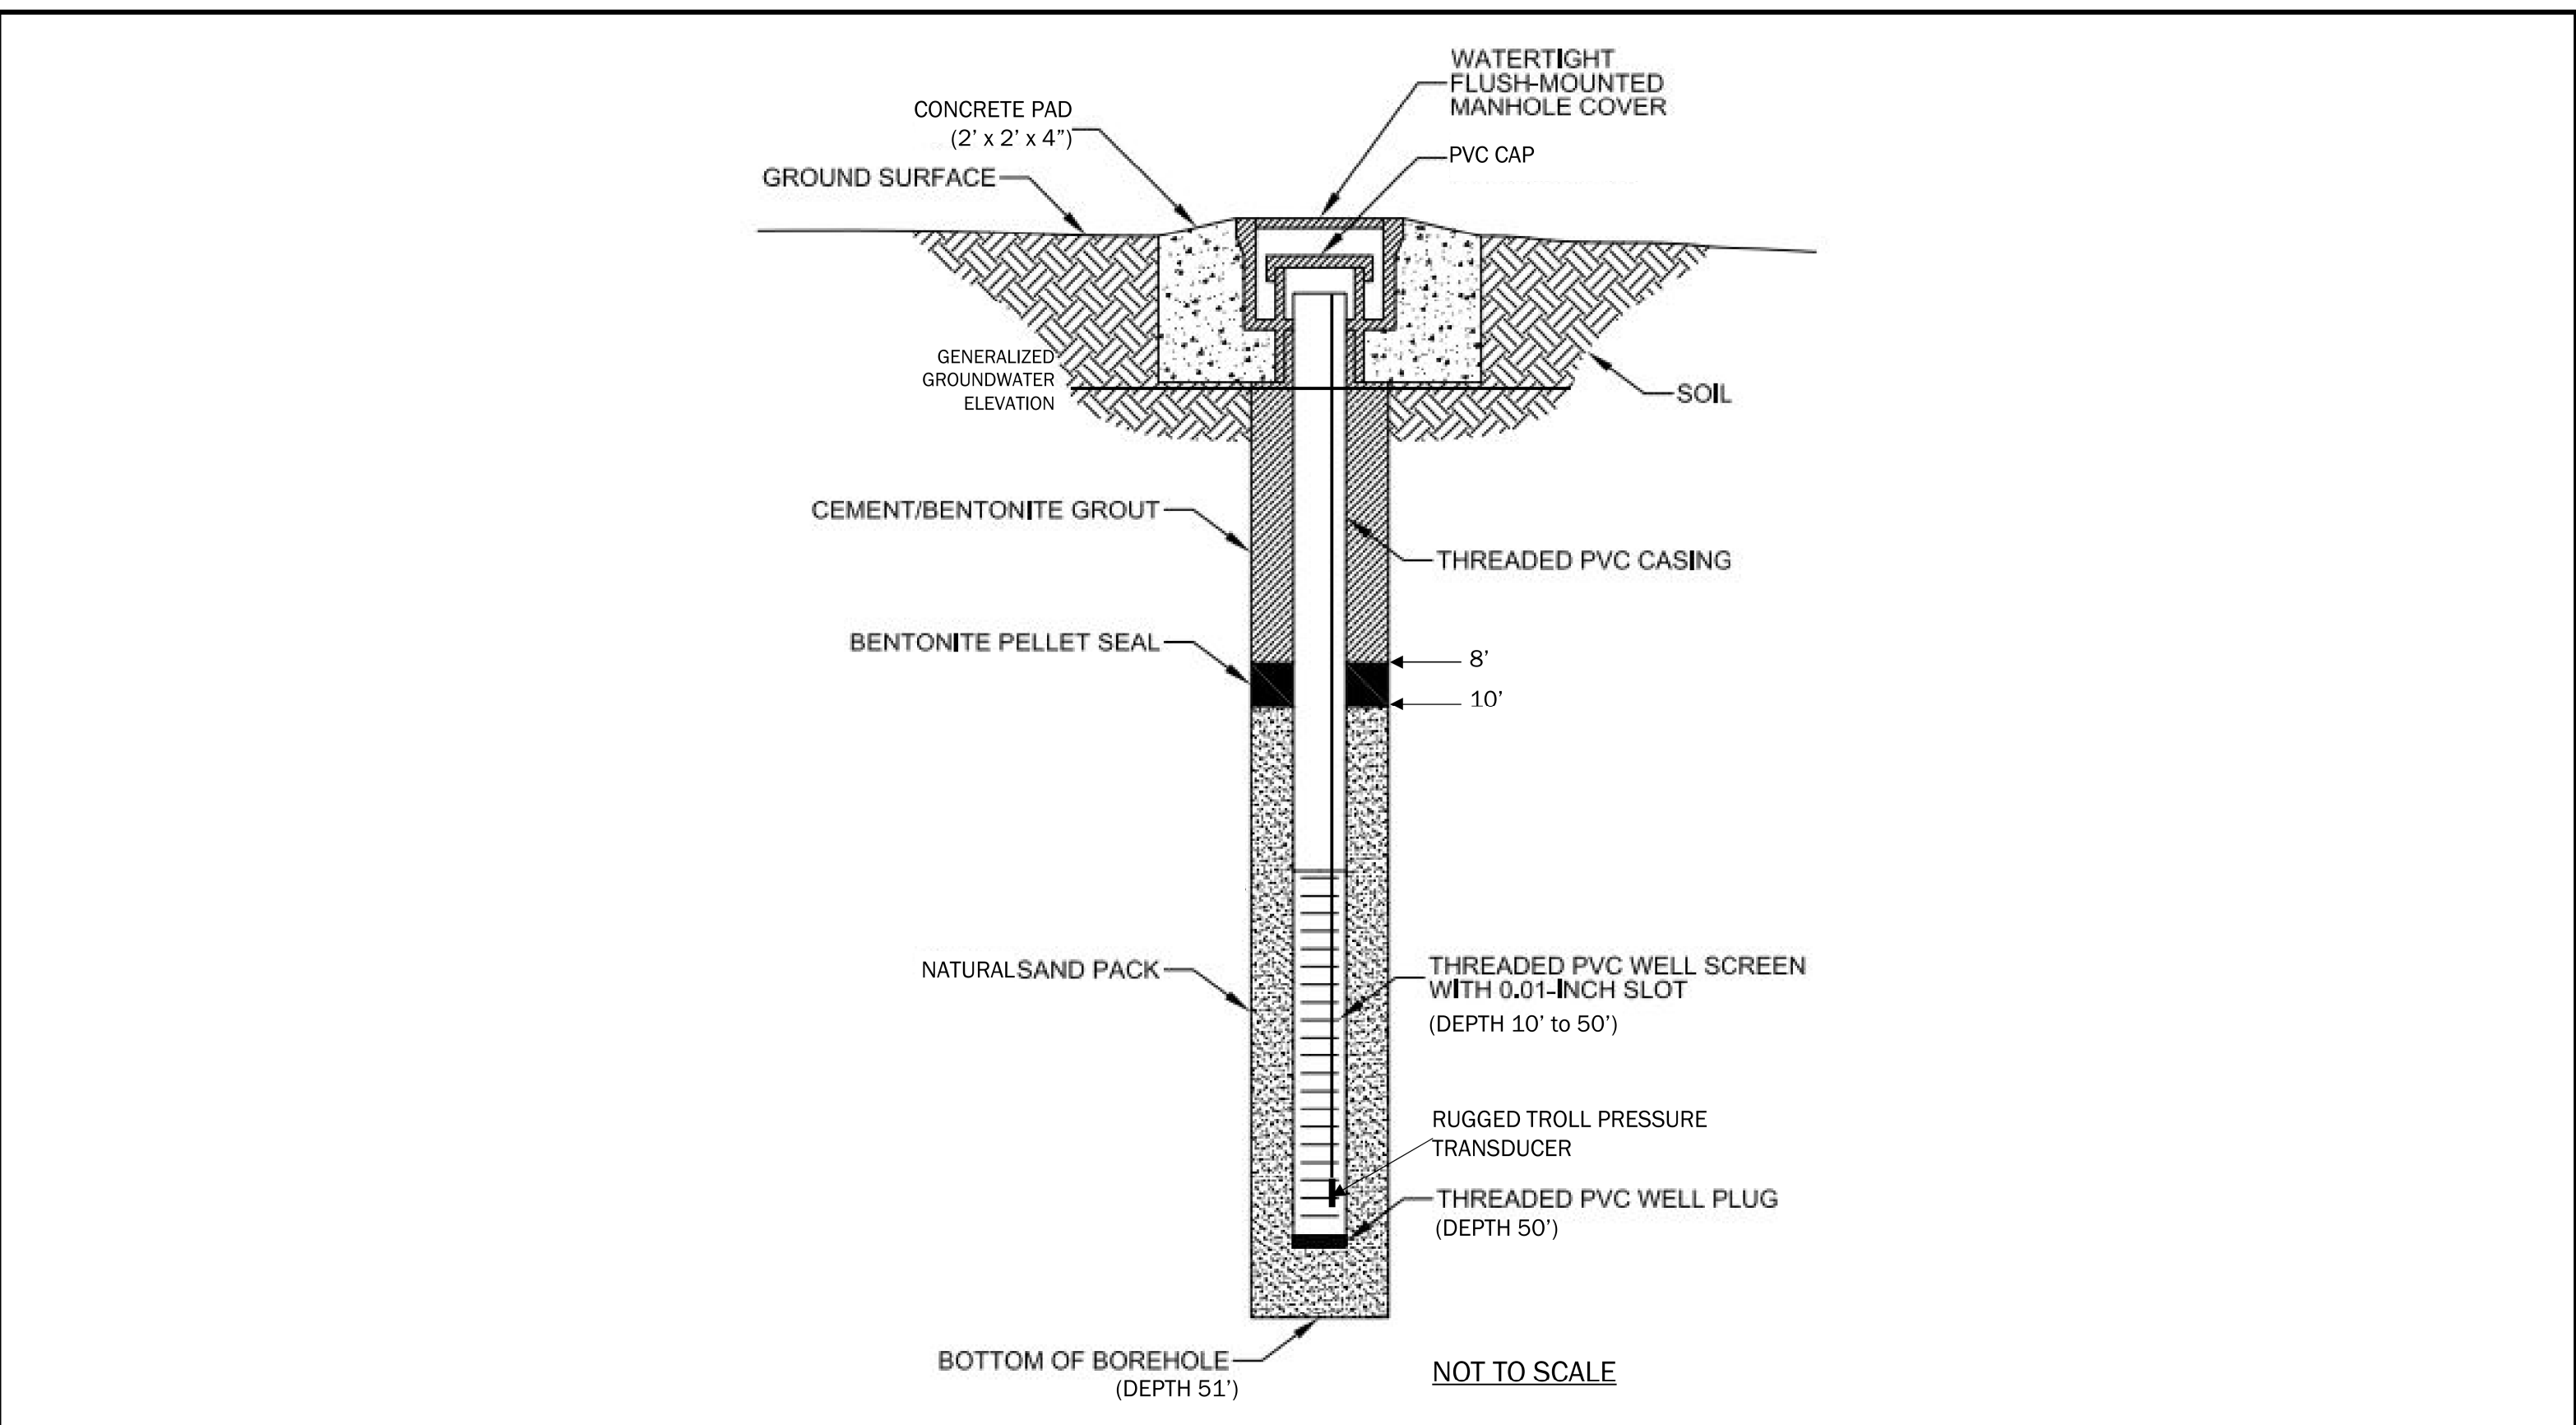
TYPICAL PIEZOMETER CONSTRUCTION DETAIL
